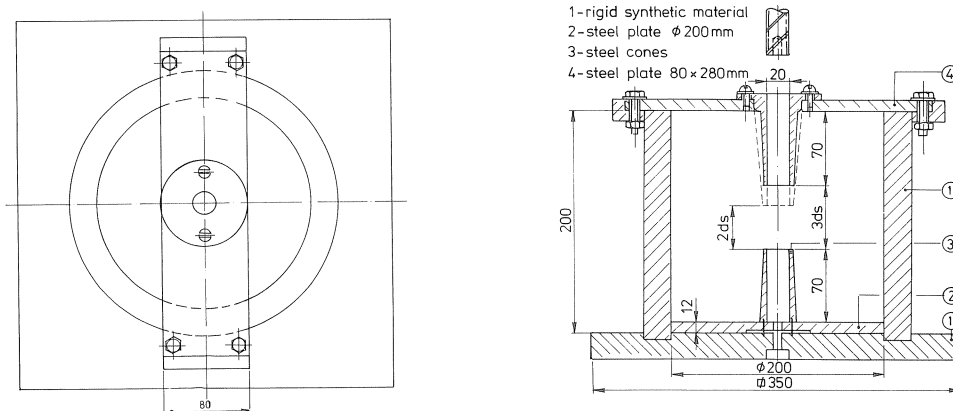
Mould for pull-out specimen. View in plan and cross-section.
